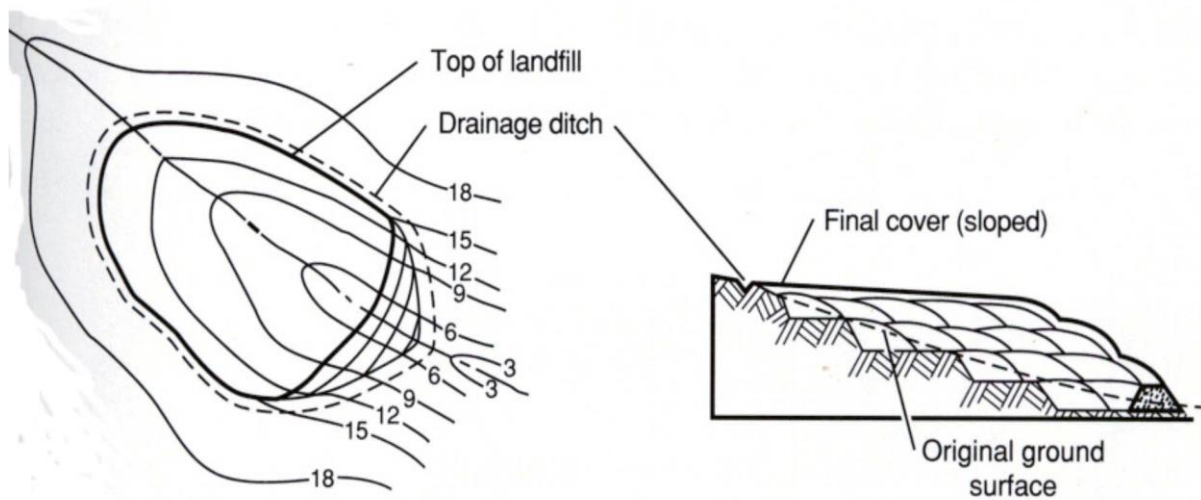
Plan and cross-section of Canyon method, Tchobanaglou et al., (1993)
